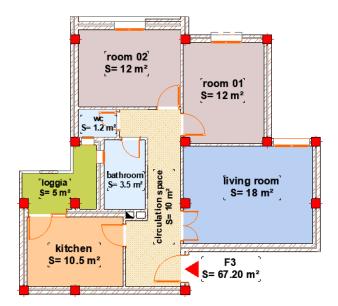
Typical floor plan of a collective social housing project (LPL). (Source: ACAD design firm, 2023)
